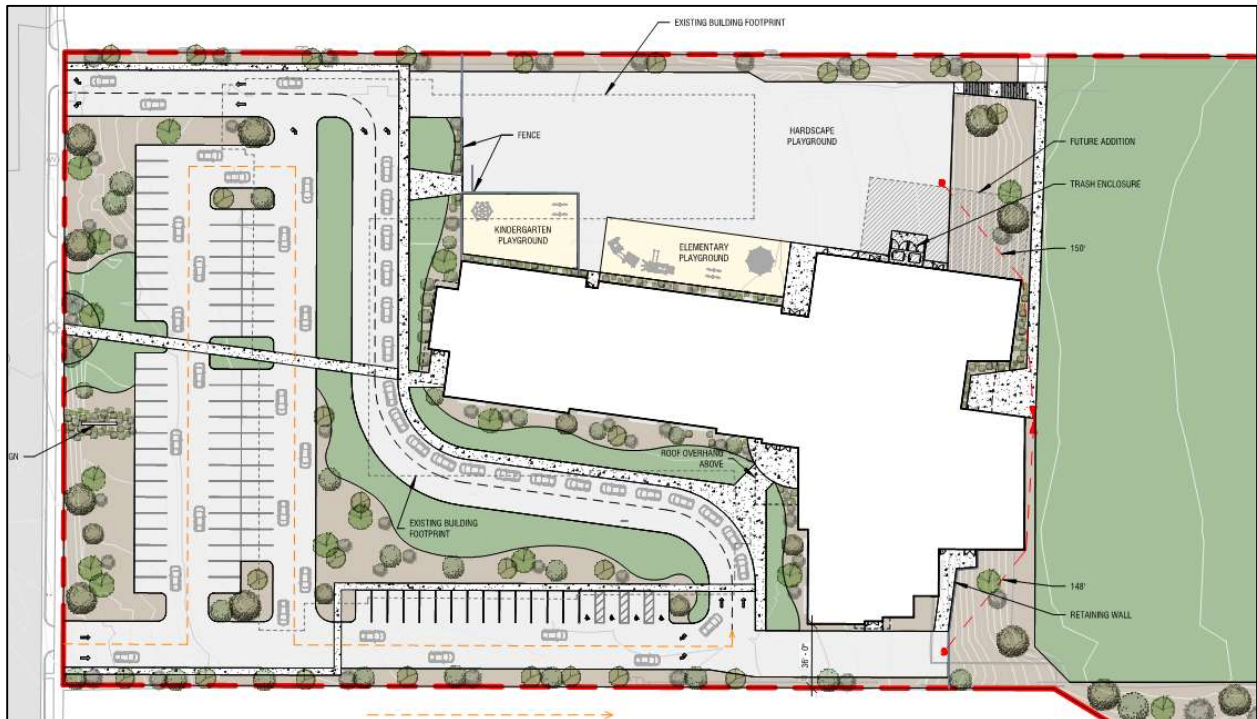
Option 3 – Shows conceptual site plan of the new school upon completion
